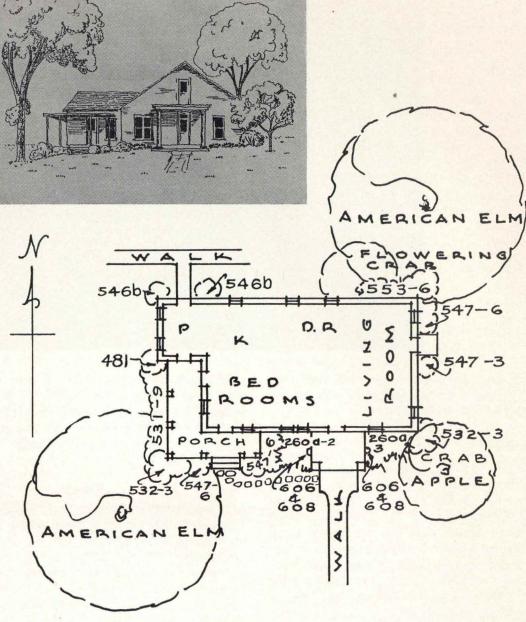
Proposed plantings to improve the appearance of a house built about 1880.
